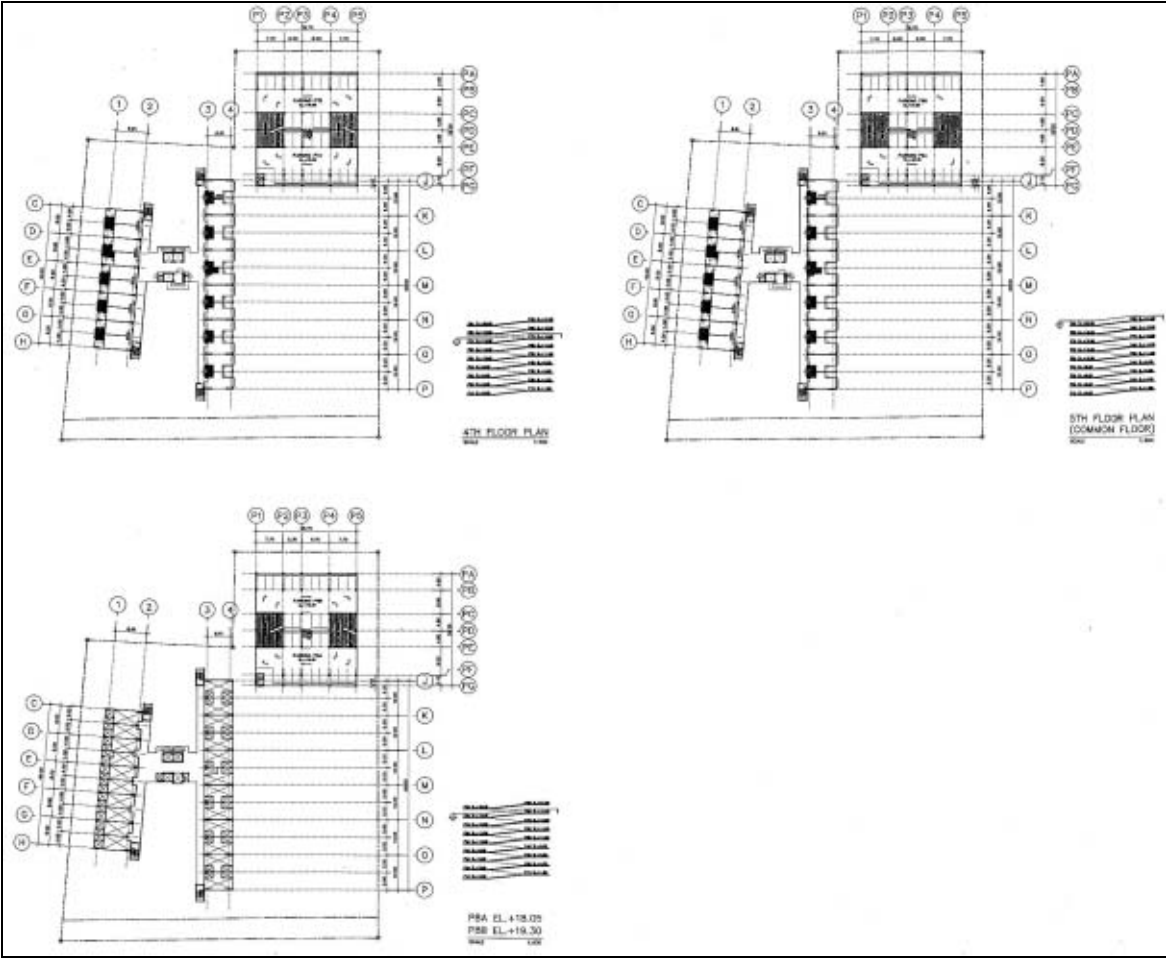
Building Layout Plan at Site-B'(4TH Floor ~ 5TH Floor)
